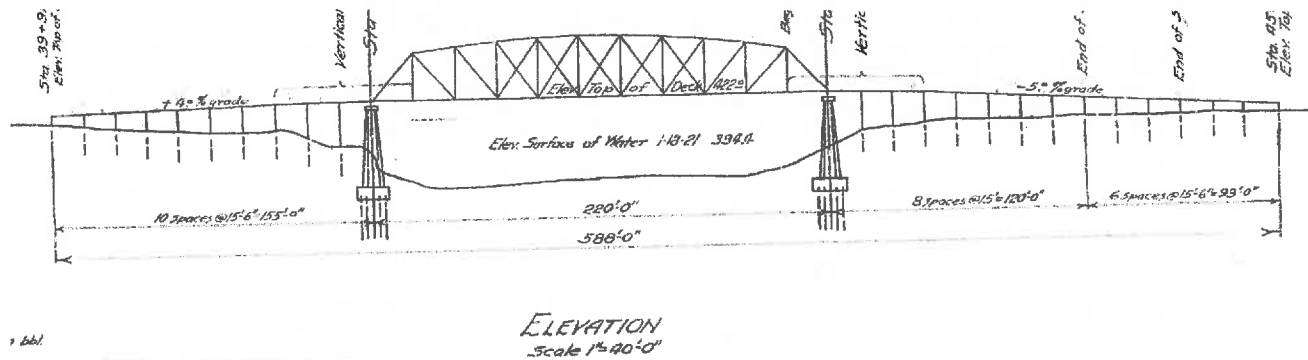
Elevation View of Meadowbrook Bridge from February 1921 Design Drawings
